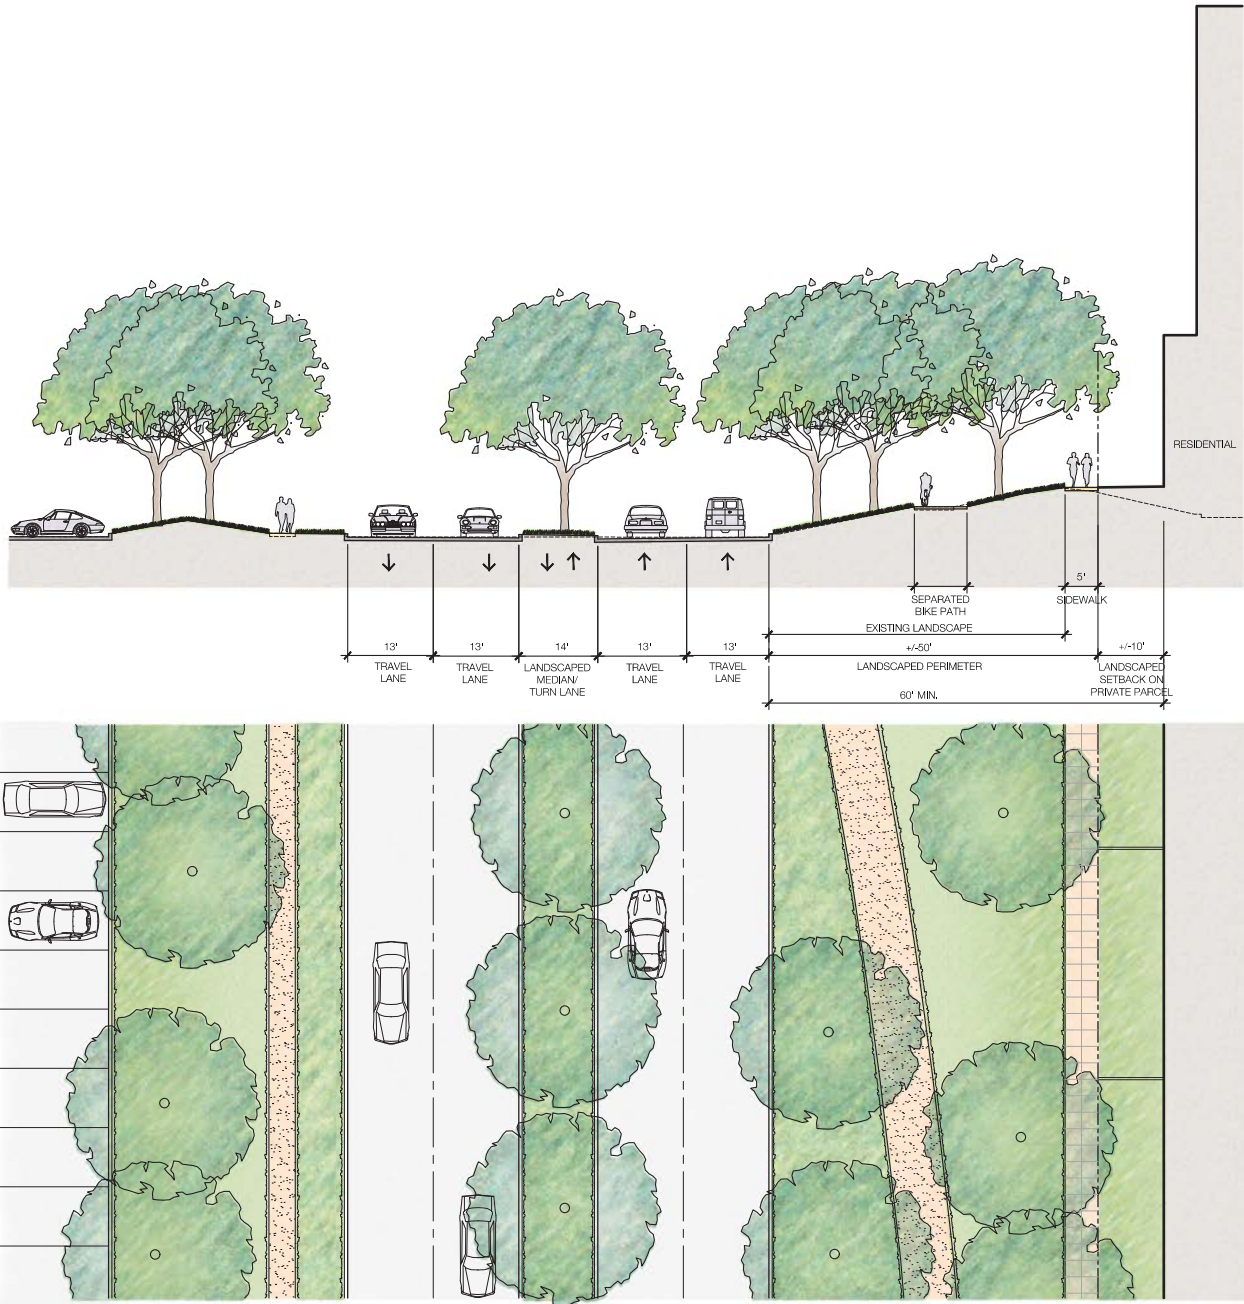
Perimeter Parkway at Camino Ramon & Executive Parkway
